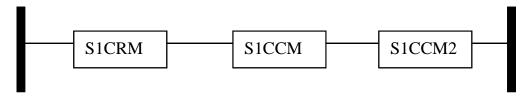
Casting bed layout of the transfer length test beams (Trent 2007).
